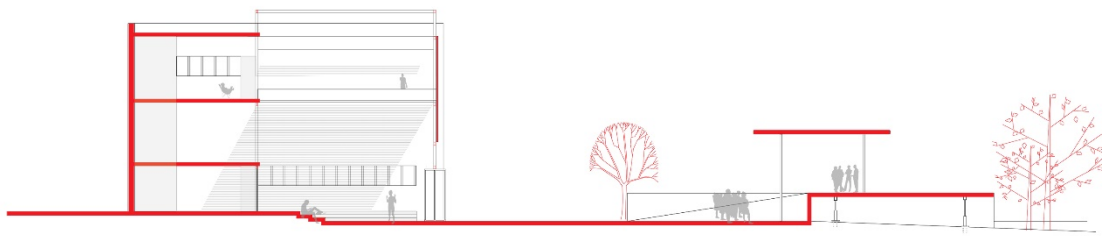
Longitudinal Section through Town Hall (Source: Author)
